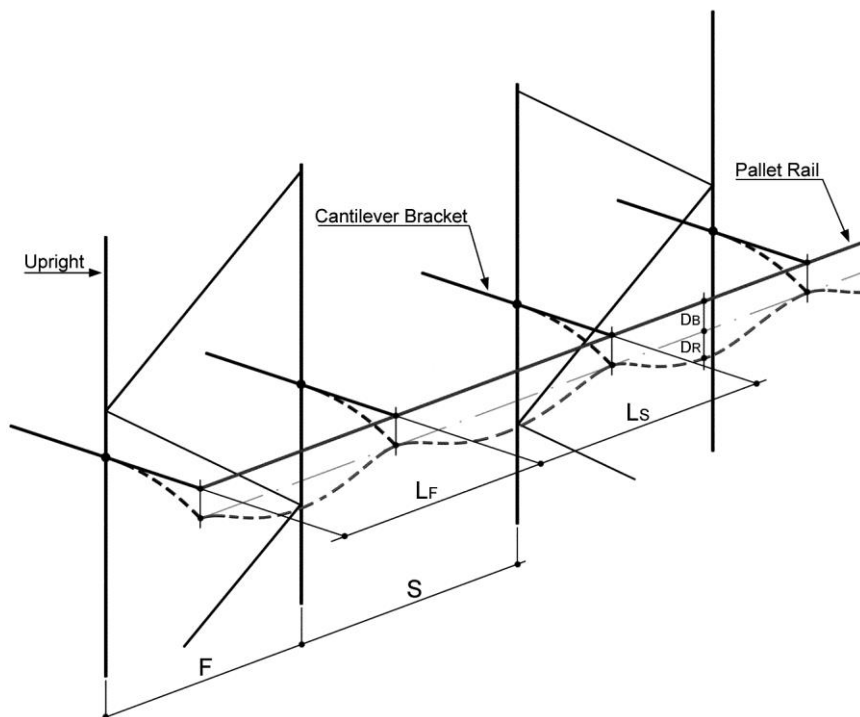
Deformation of the load support level (cantilever bracket plus pallet rail)
